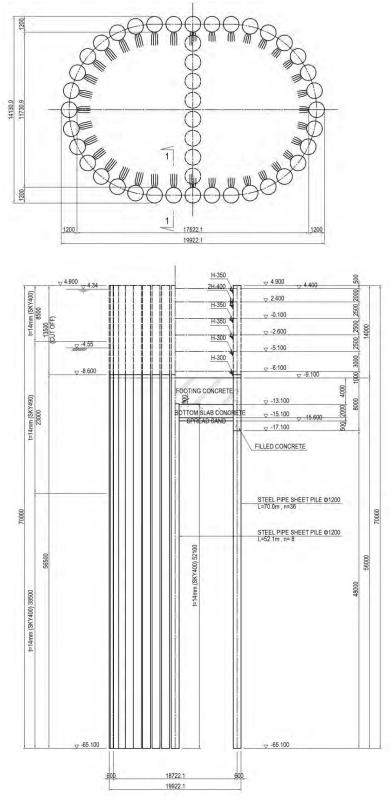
Dimensional Drawing of Foundation Shape
